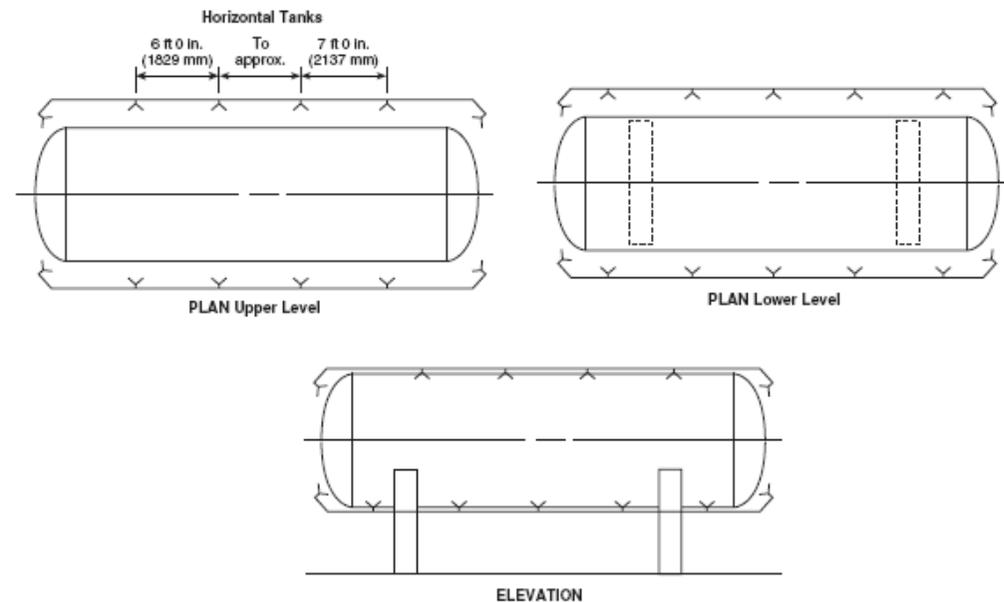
Typical Horizontal Tank Protection.
